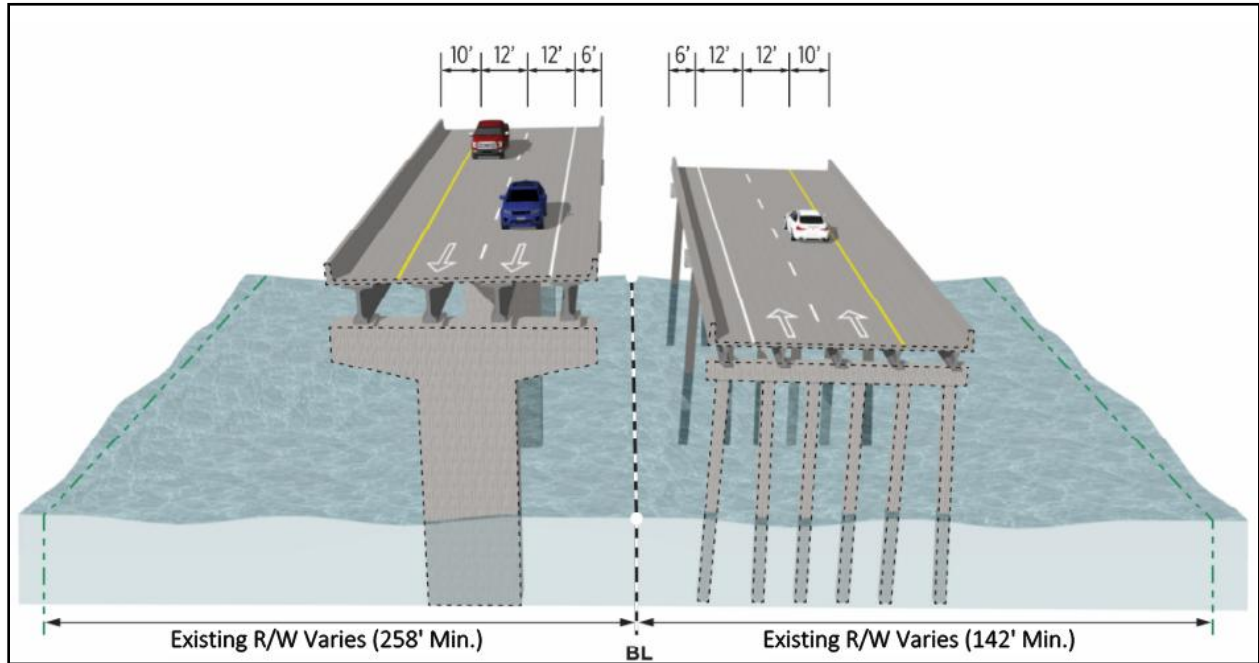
Existing Bridges Typical Section – Segment 2 – Gandy bridges
